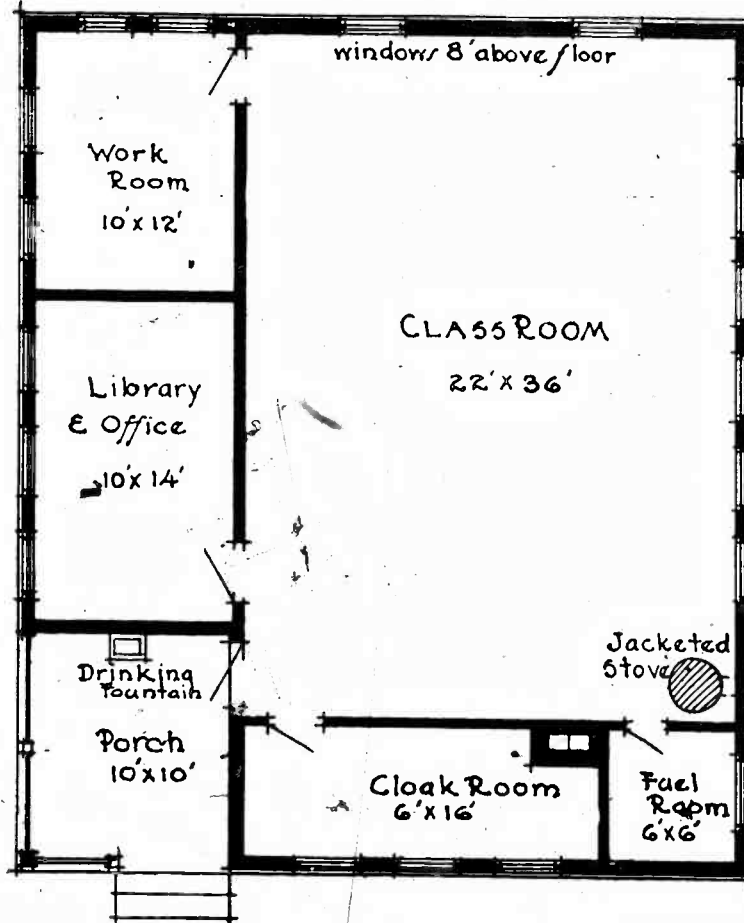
Floor plan for one-teacher rural school of minimum cost.
